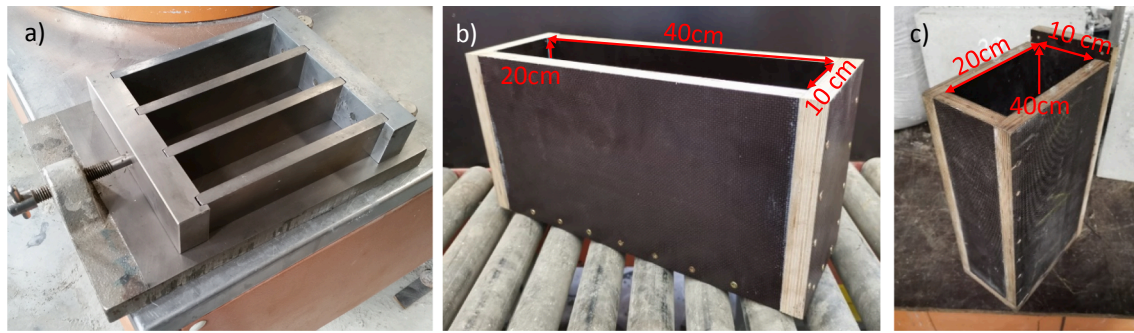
Mould and dimensions of the samples: a) prisms, b) and c) masonry blocks.
